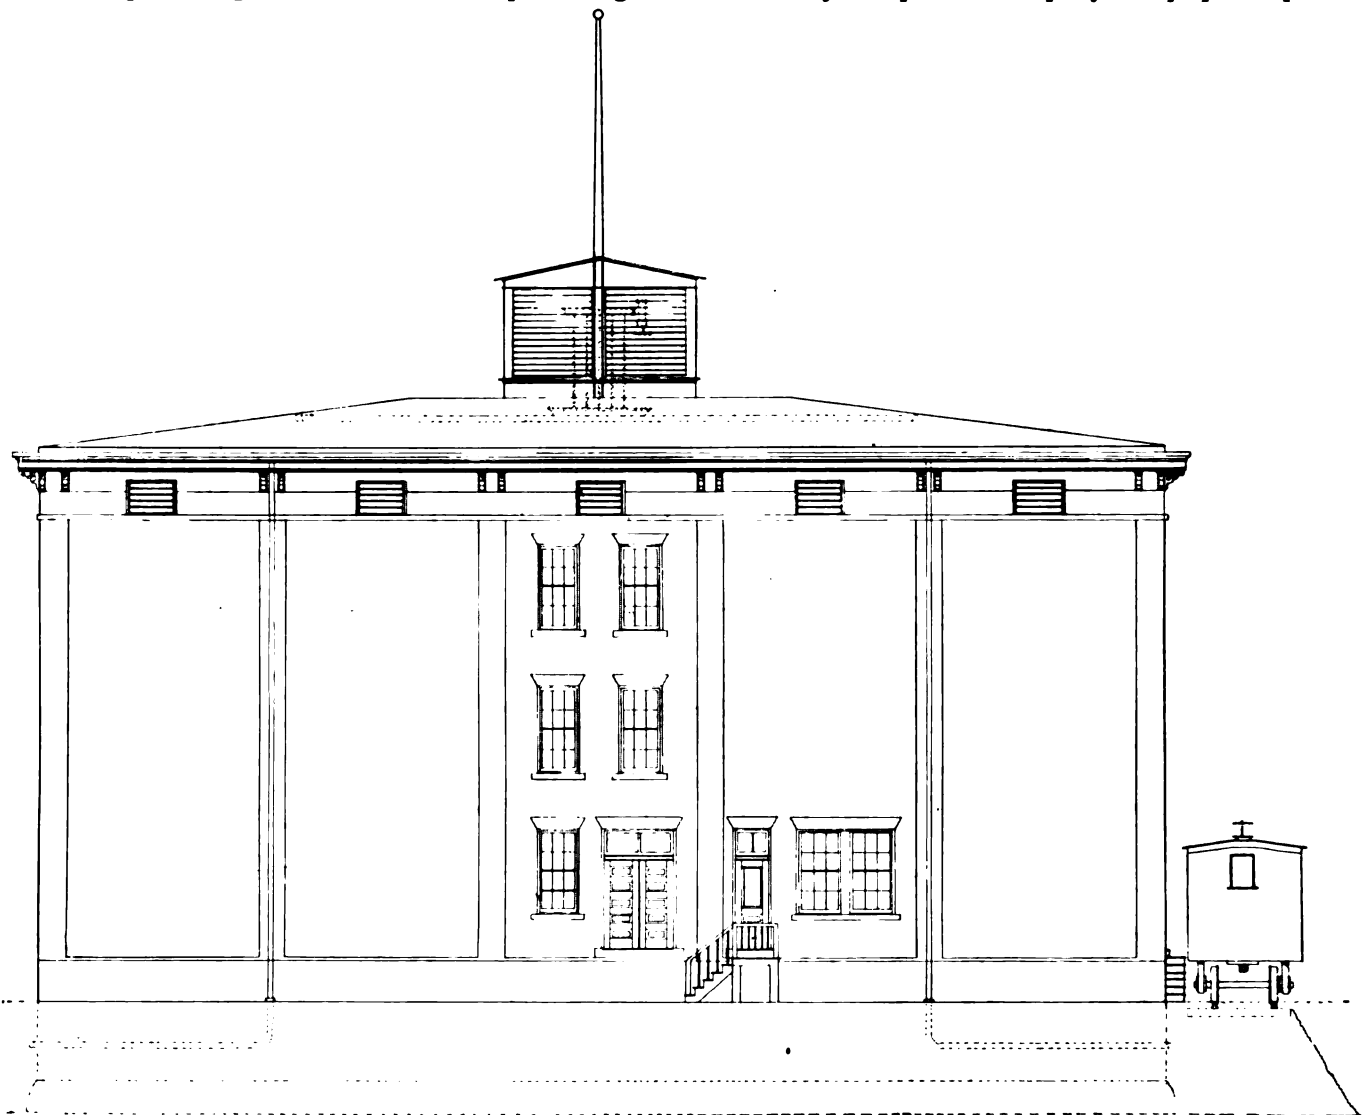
FRONT ELEVATION, TOLEDO COLD STORAGE CO.'S NEW WAREHOUSE, TOLEDO, OHIO.
